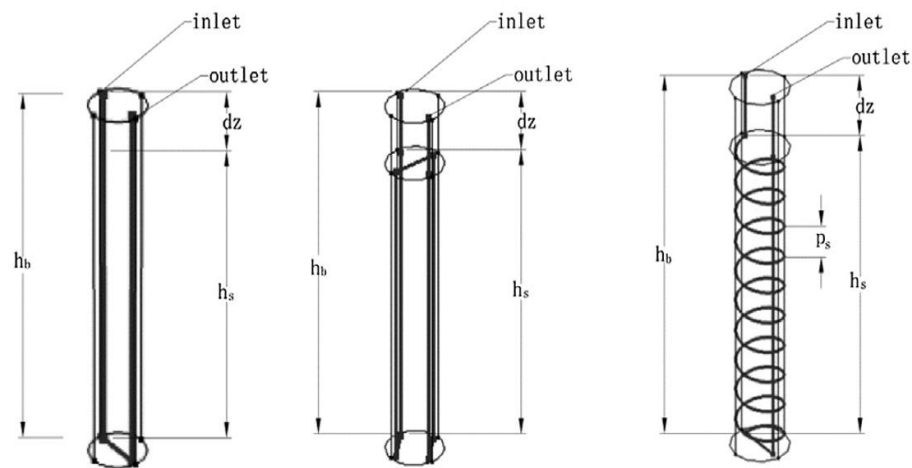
(a) U-shaped tube (b) W-shaped tube (c) Spiral-shaped tube [56].
